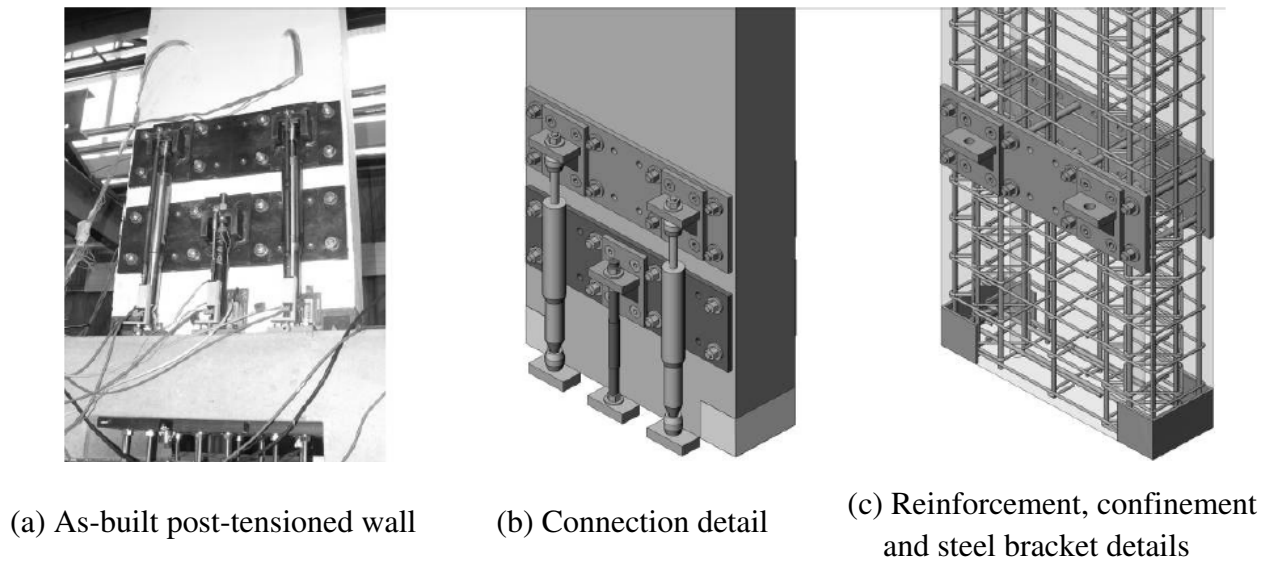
Post-tensioned, precast wall unit [1.24]
